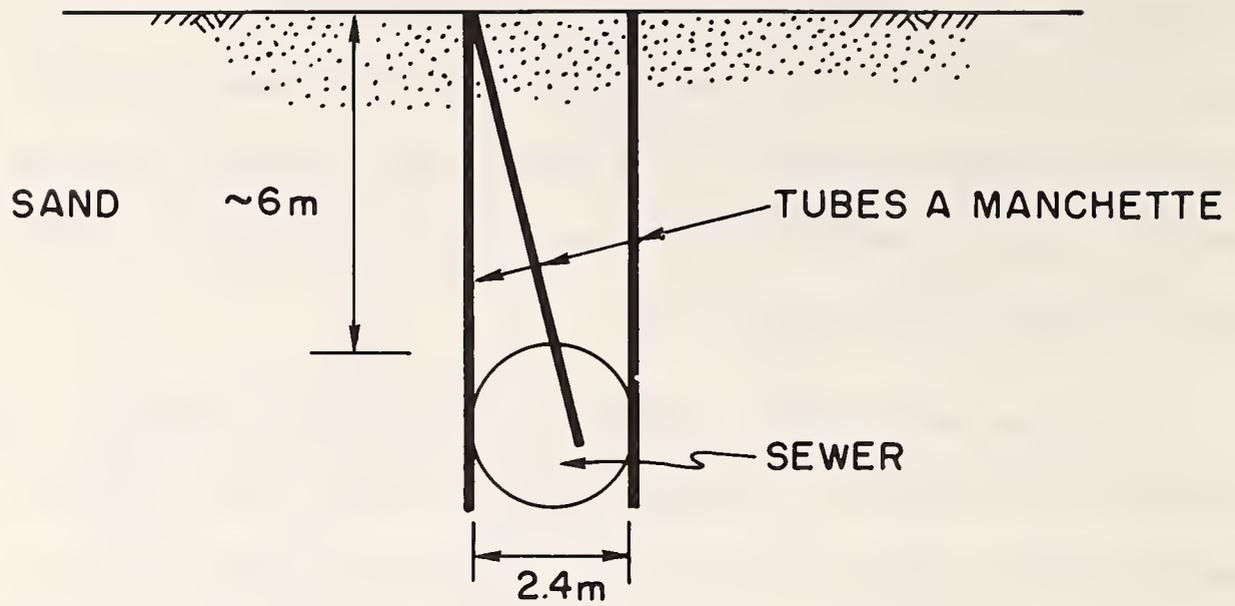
TUNNELING CONDITIONS FOR GROUDED SECTION OF SEWER TUNNEL, WARRINGTON NEW TOWN DEVELOPMENT
